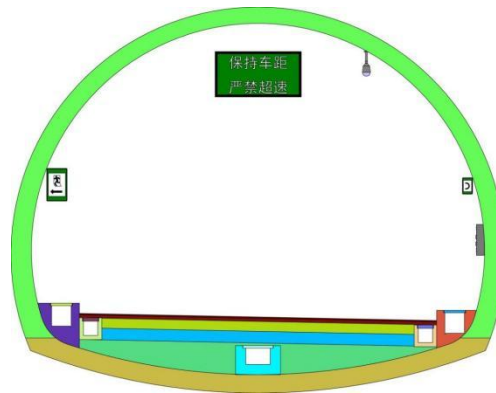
Elevation View of the BIM Model Layout for Fire Protection Facilities
